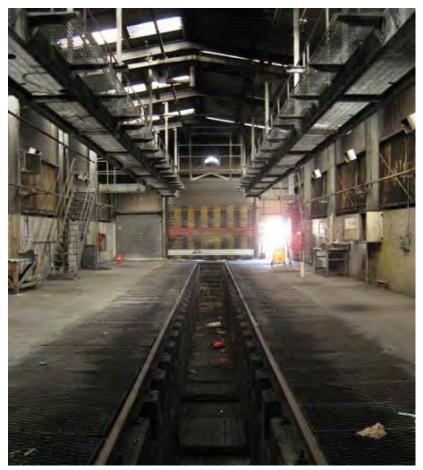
Underframe Cleaning Shed (4) interior looking west.
